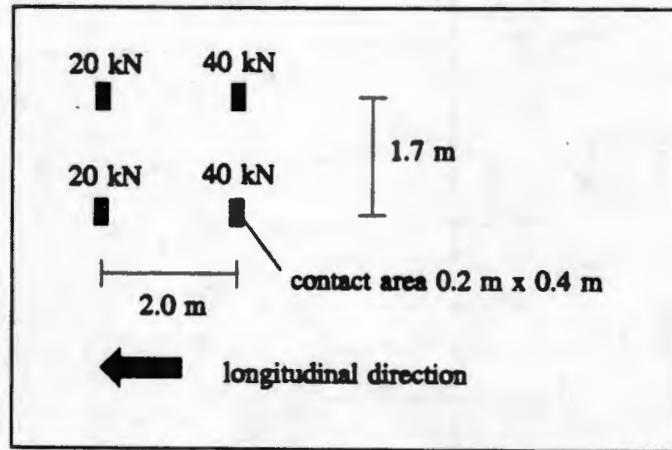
Maintenance vehicle load arrangement of the light traffic bridge used as the base of the scale model studied.
